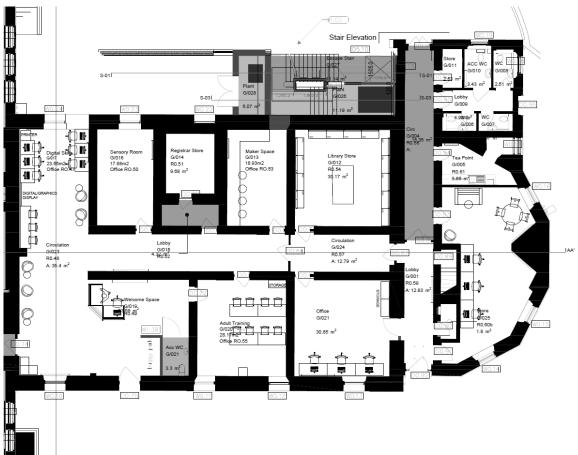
Plan of the proposed Learning Centre in Shirehall (see Appendix 7 for more detail)
